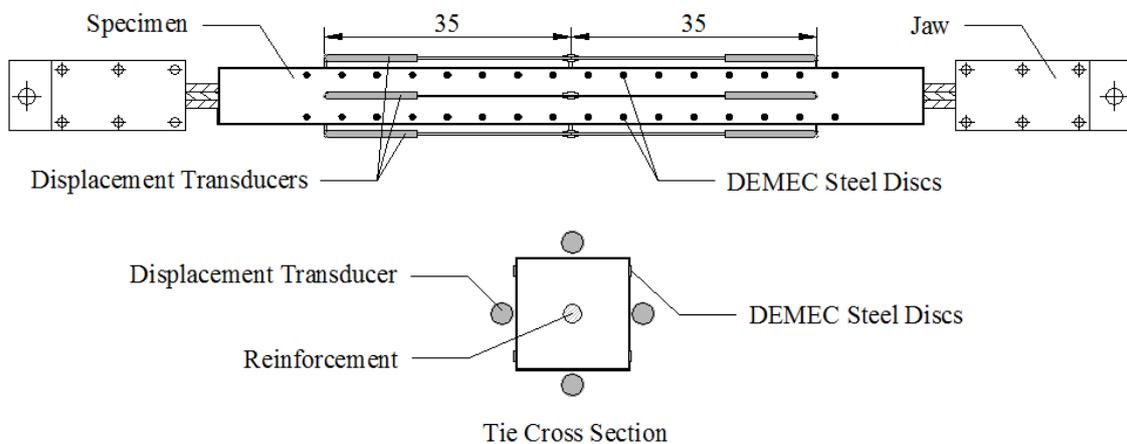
Measurement equipment: positions of the displacement transducers and the DEMEC points along the element.
